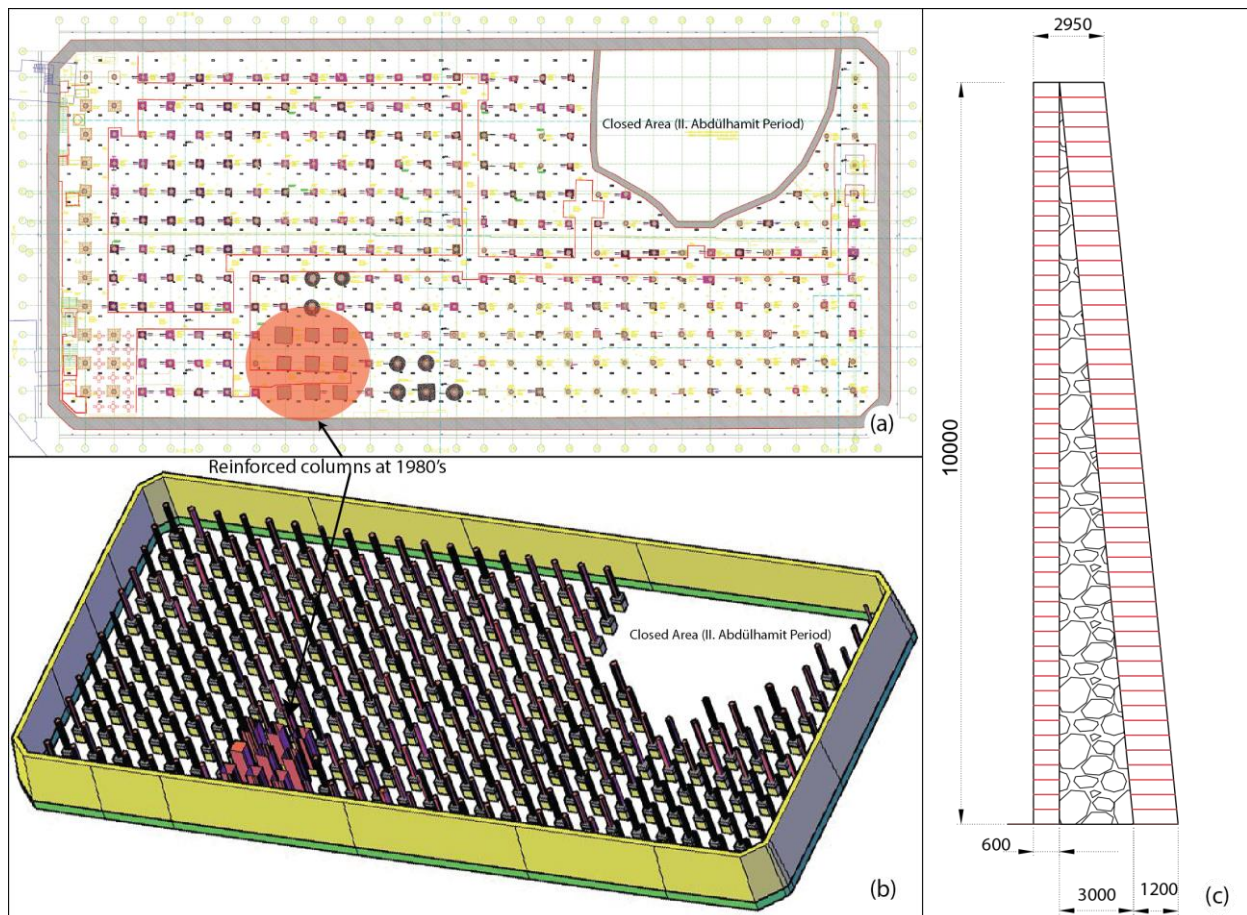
Technical drawing of Yerebatan (Basilica) Cistern (a) Plan view. (b) 3D Isometric view. (c) Sketch drawing of the side walls cross-sectional view
